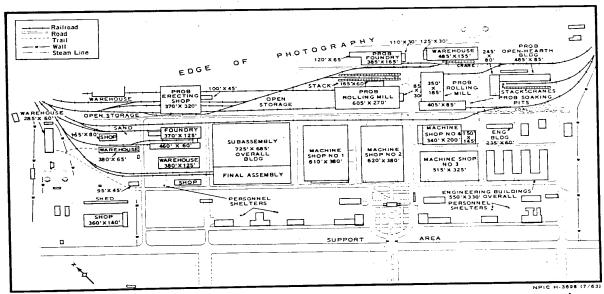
LAYOUT OF HEAVY FABRICATION PLANT.
